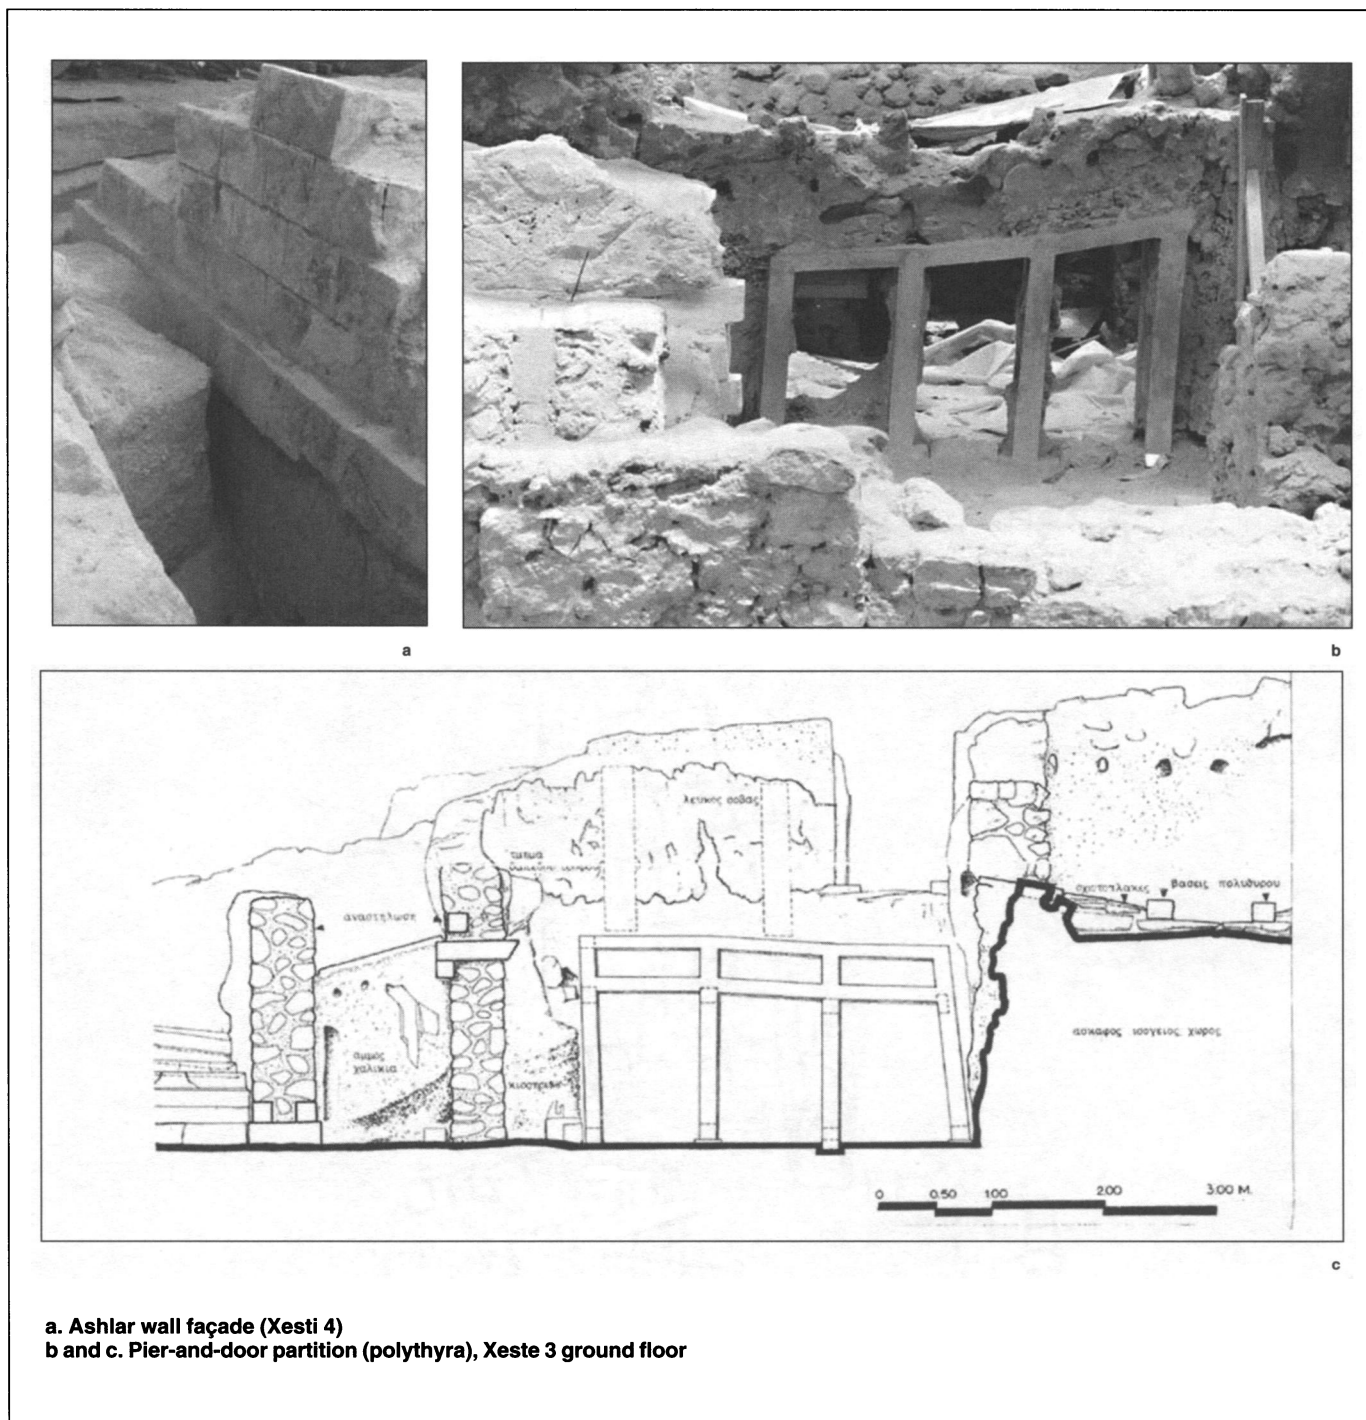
Akrotiri, Thera – Ashlar Buildings. (Source: Akrotiri Excavations Archives).
